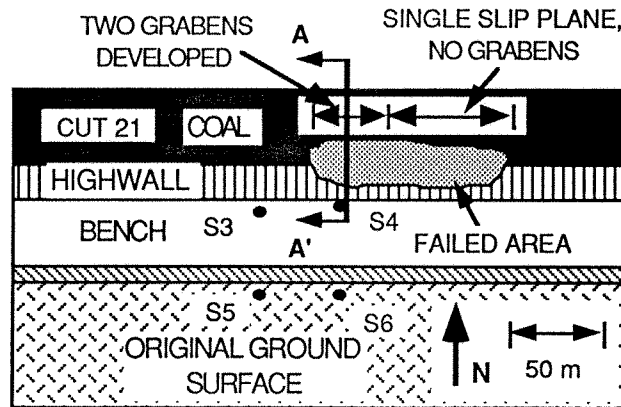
Plan view of failure in highwall Pit 03, April, 1988.
